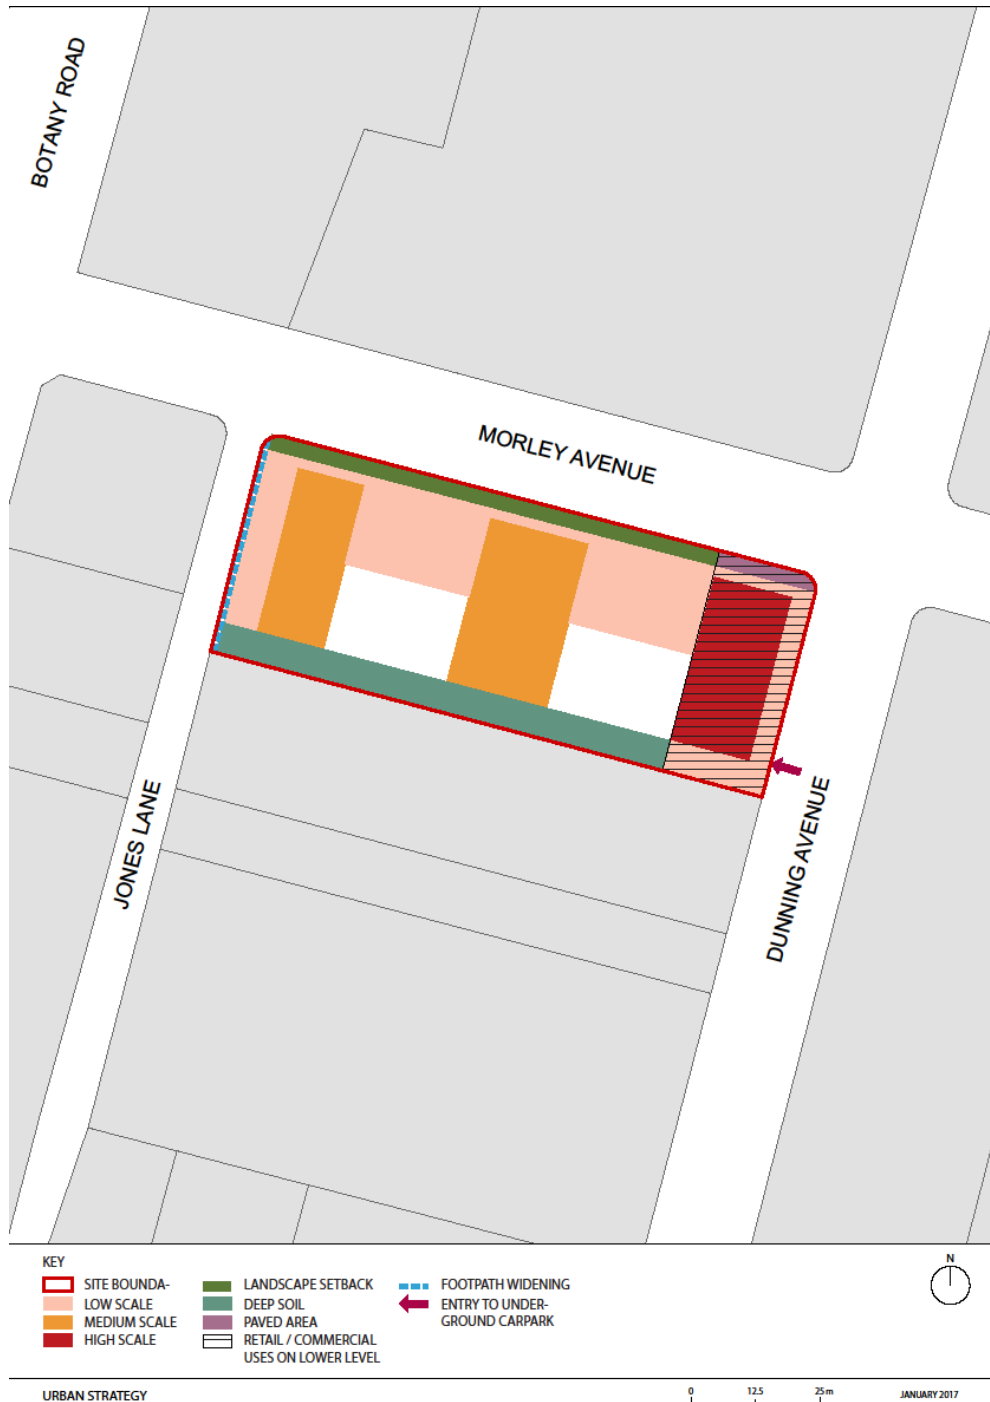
XX – 102–106 Dunning Avenue, Rosebery – Urban strategy
